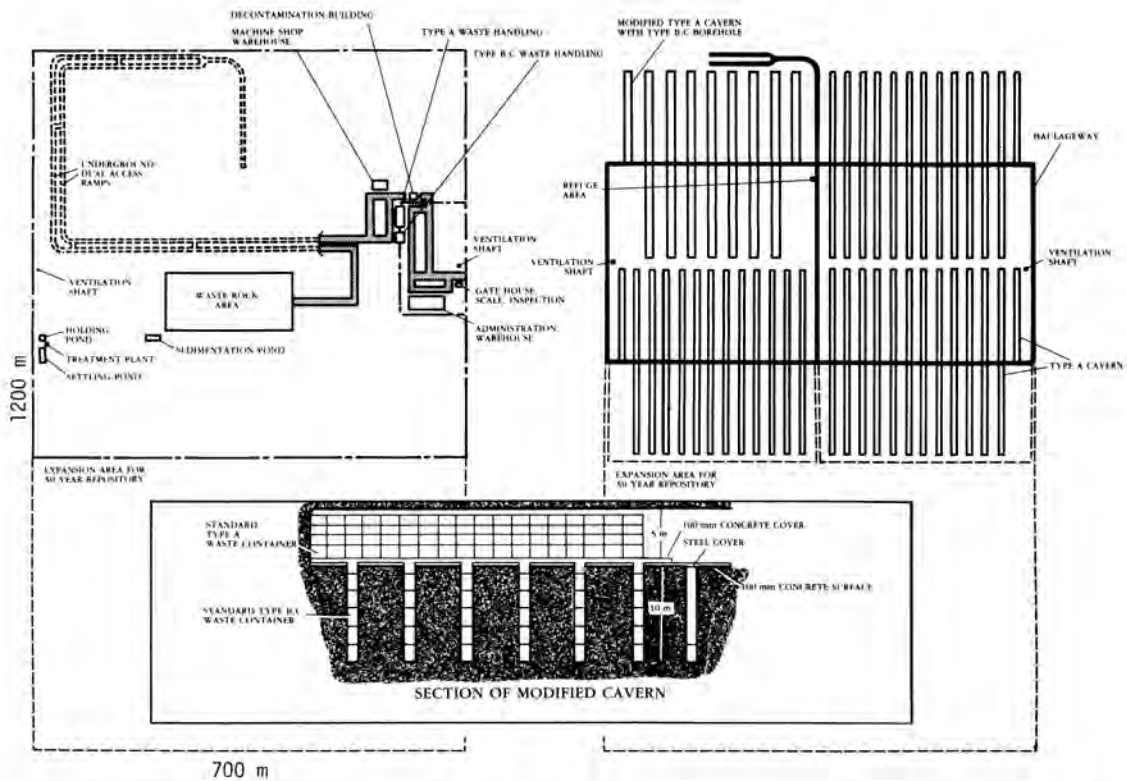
Plan of Surface Facilities, Cavern Layout and Design Detail of Caverns for the Shallow Rock Cavern (or IDG) Concept.
